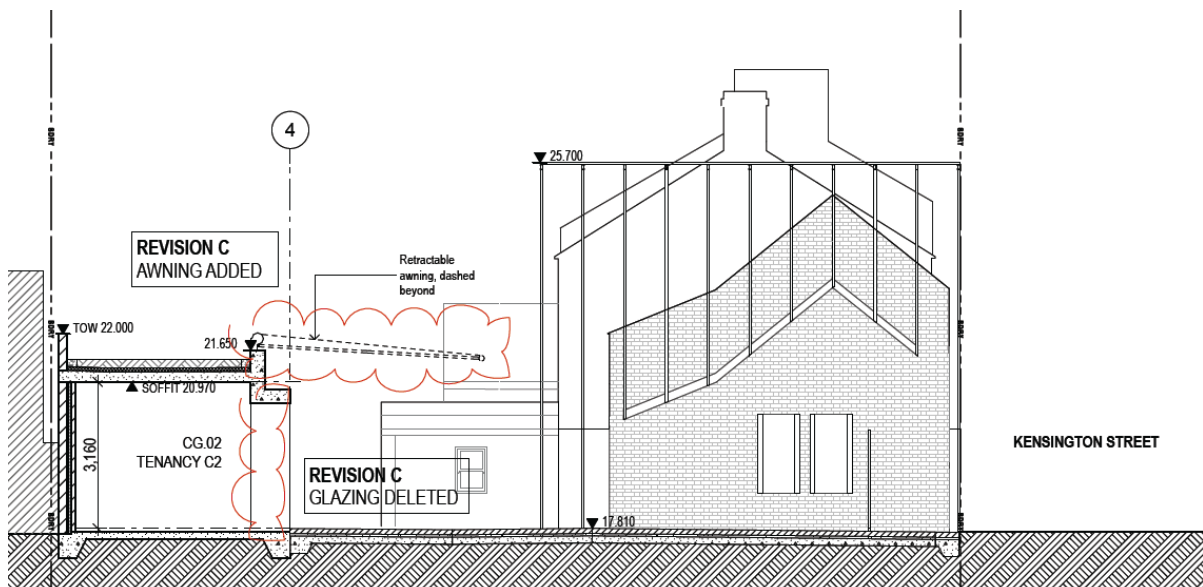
Cross Section of proposed retractable awning affixed to the rear building
